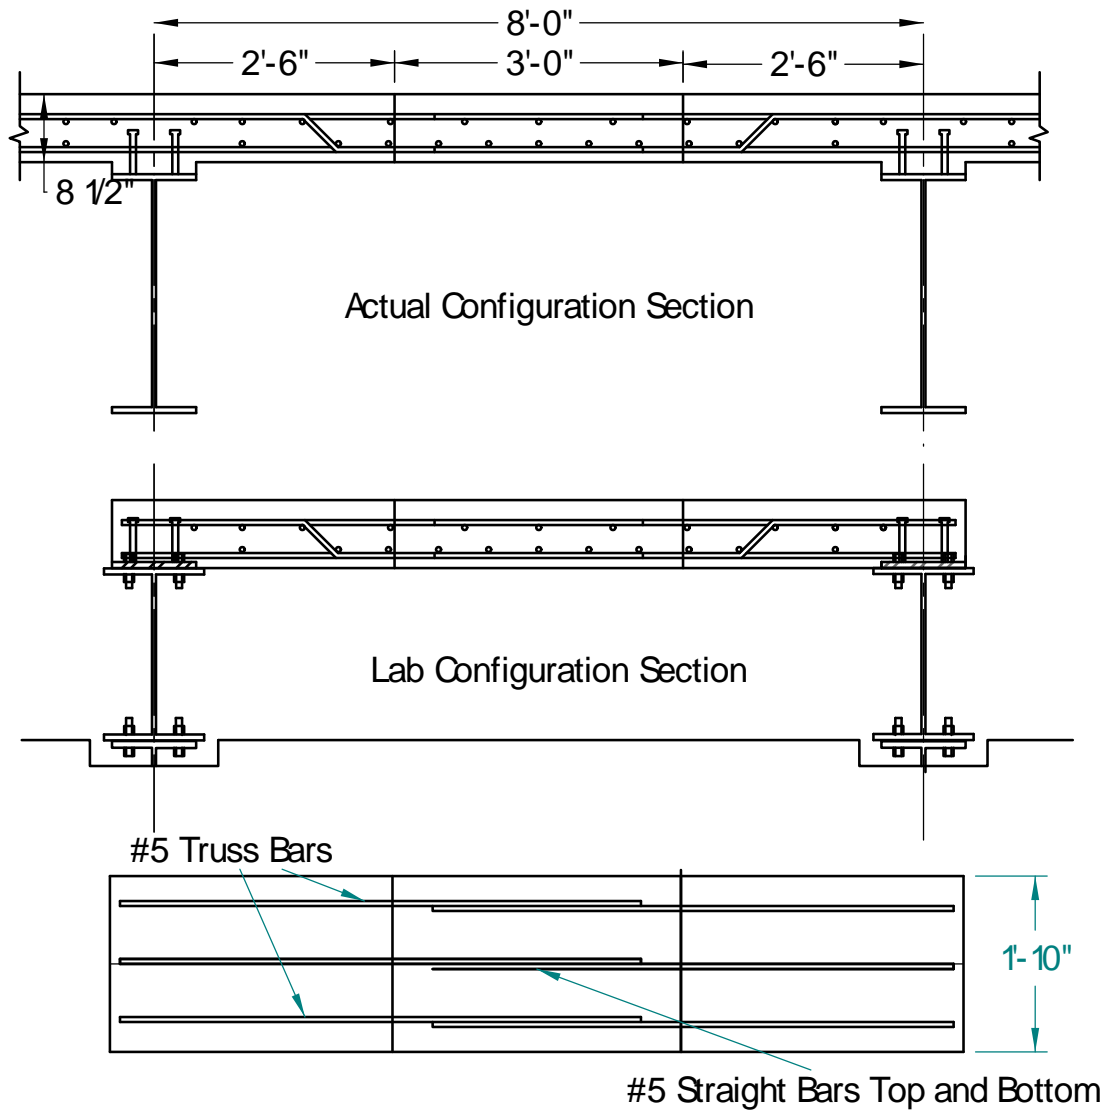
Approximate Dimensions of Slab Sections Showing Cuts Made to Extract Typical Test Specimen
